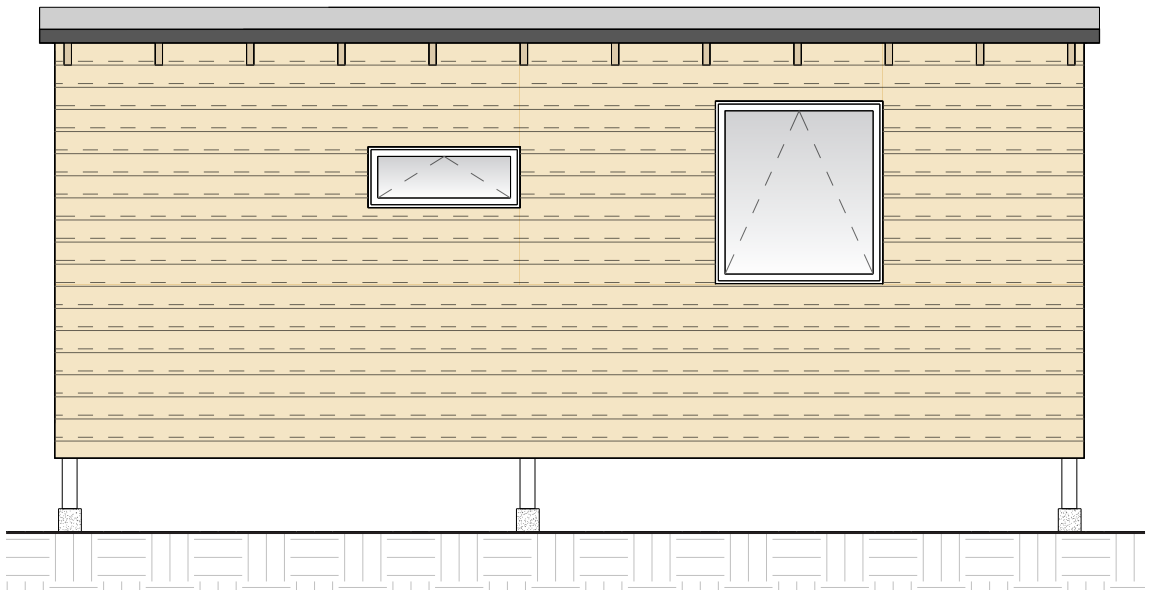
ELEVATION A-A OF THE BUILT CABIN. SCALE 1:50
